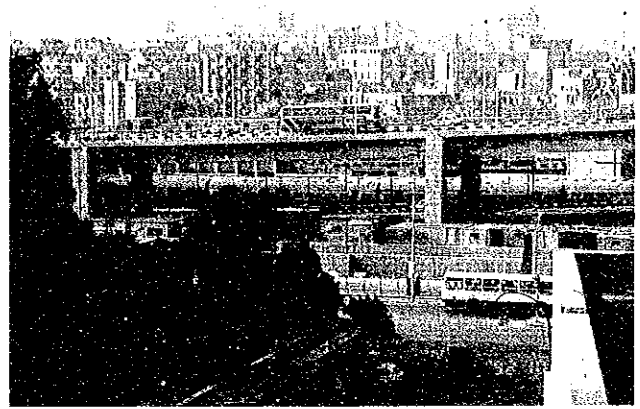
Elevated bridge in Cairo (rigid frame piers)
